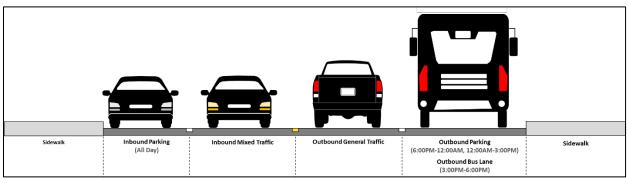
Bayers Road Proposed Interim Cross Section (Oxford Street to Connolly Street)
